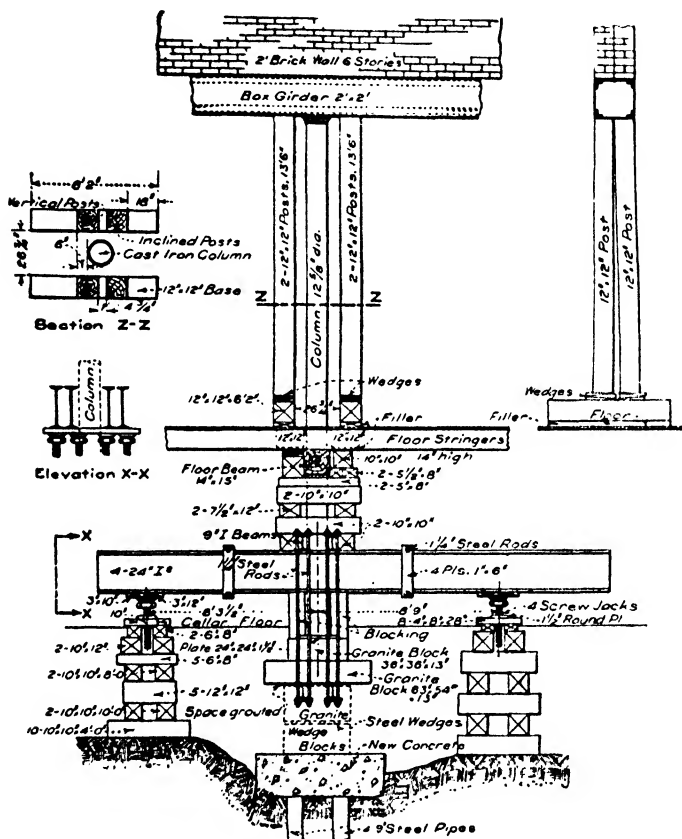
Underpinning a 300-ton Column on Quicksand, Sargent Building, New York City.
